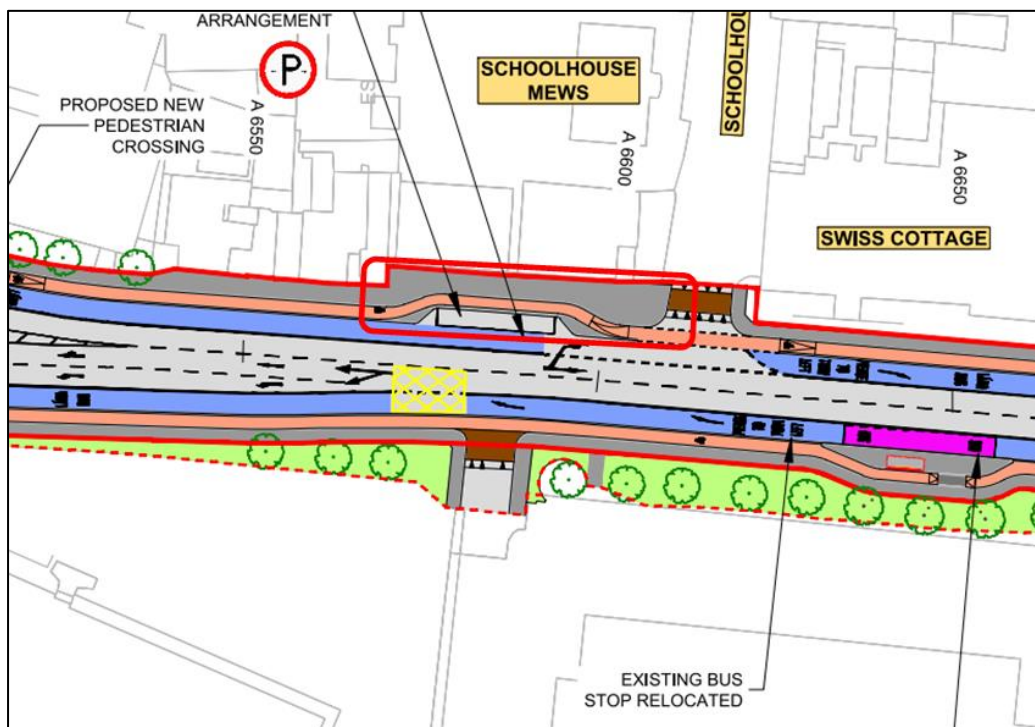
Proposed new Layout on the Swords Road (R132)
